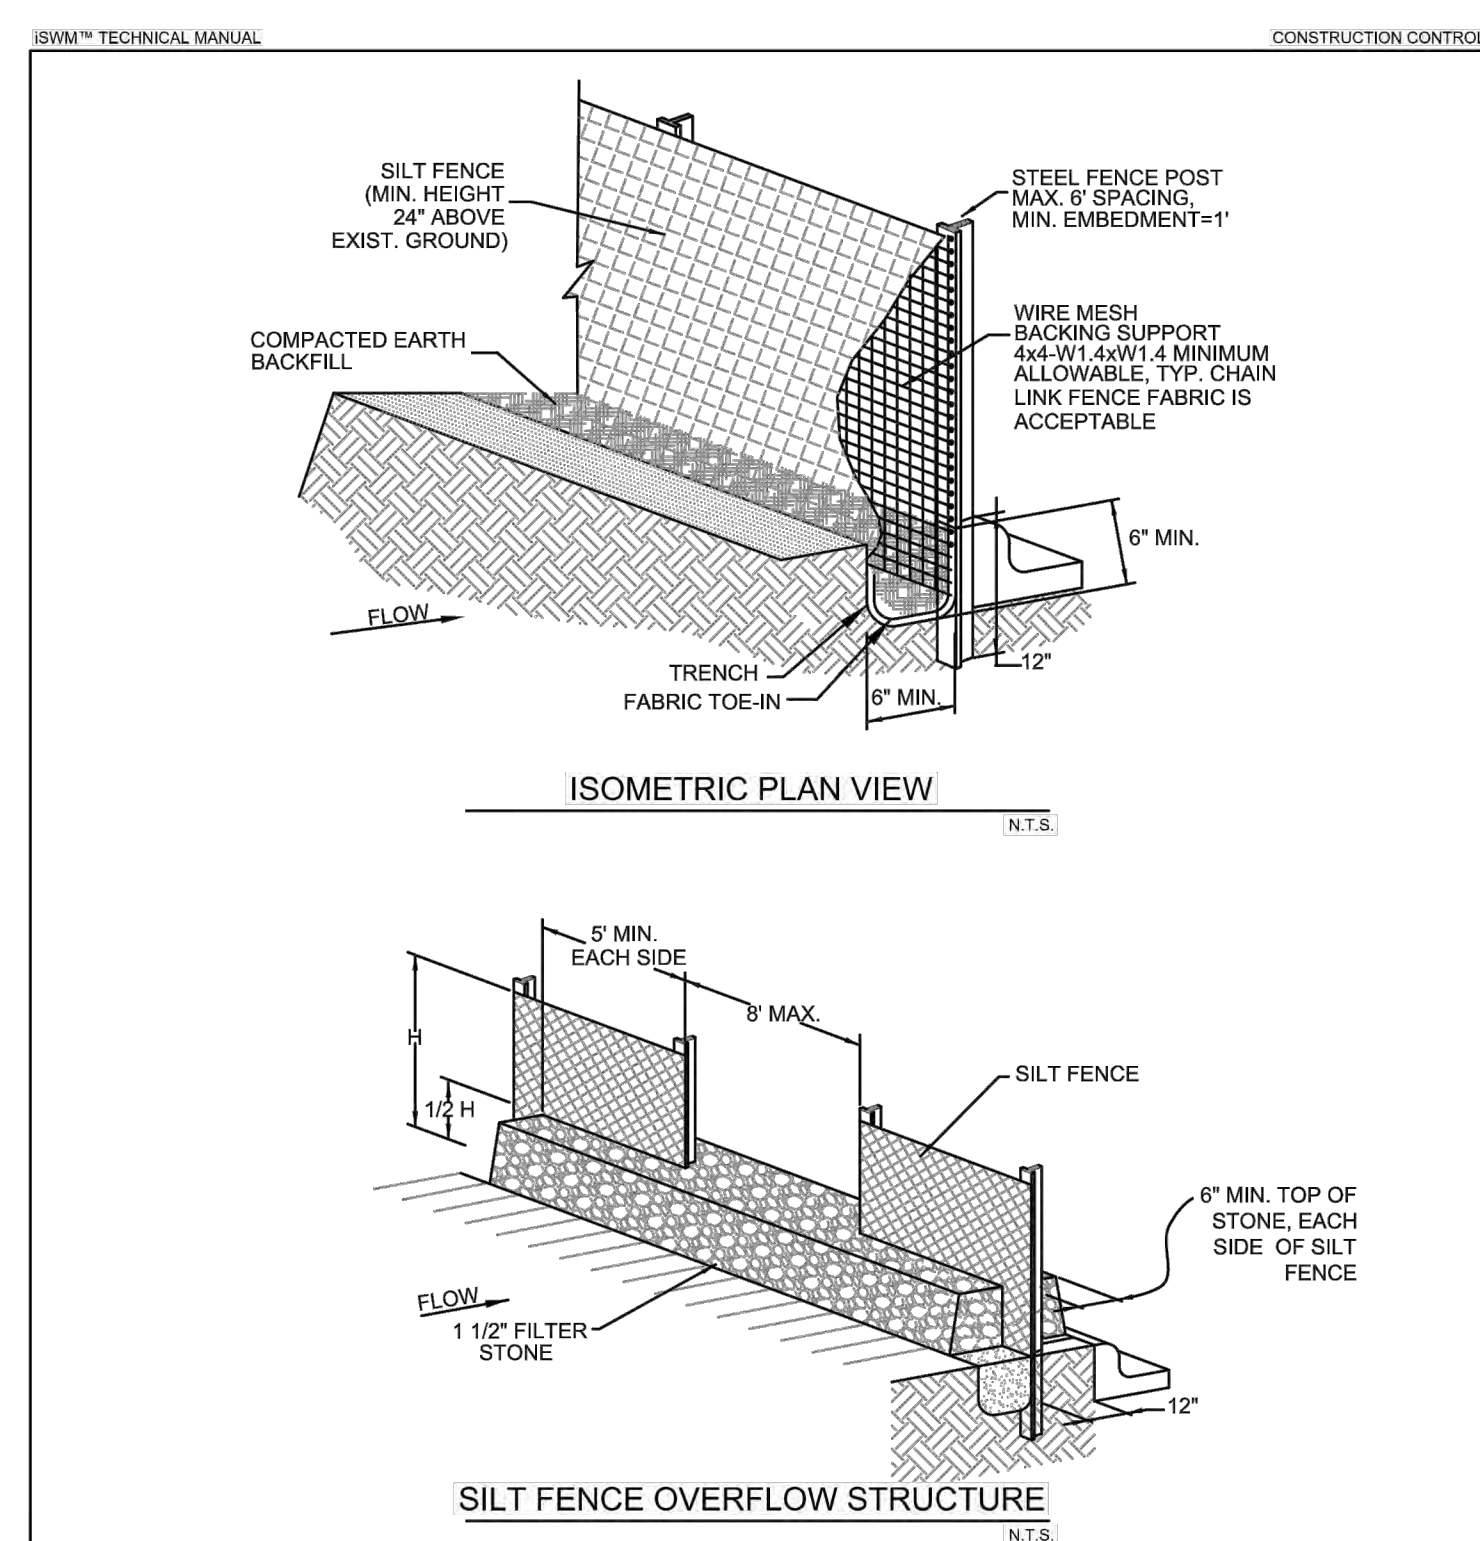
STANDARD CONSTRUCTION DETAIL - FOR SILT FENCE (1 OF 2)
